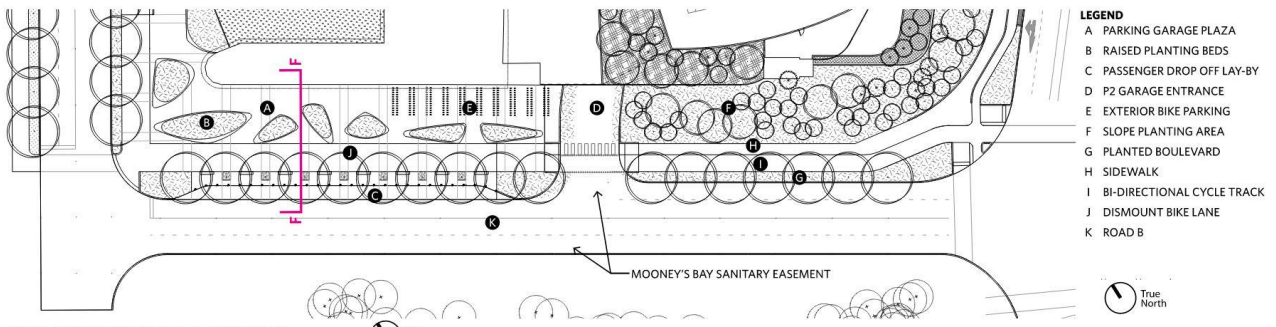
shows the landscape treatment between Road B and the Parking Garage. It includes a bike and pedestrian plaza at the intersection of Roads A and B, a pedestrian entrance at this plaza, a drop-off layby lane on Road B, a vehicular access to the garage from Road B. The plaza is intended to be an end point for cyclists on the multi-use path. To that end, signage will be posted for cyclists to dismount their bikes and walk them to the bike parking area within and alongside the Parking Garage.
